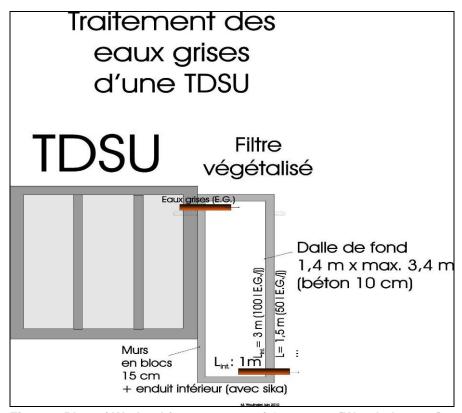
Plan of Wetland for treatment of Greywater [Wauthelet2010]
